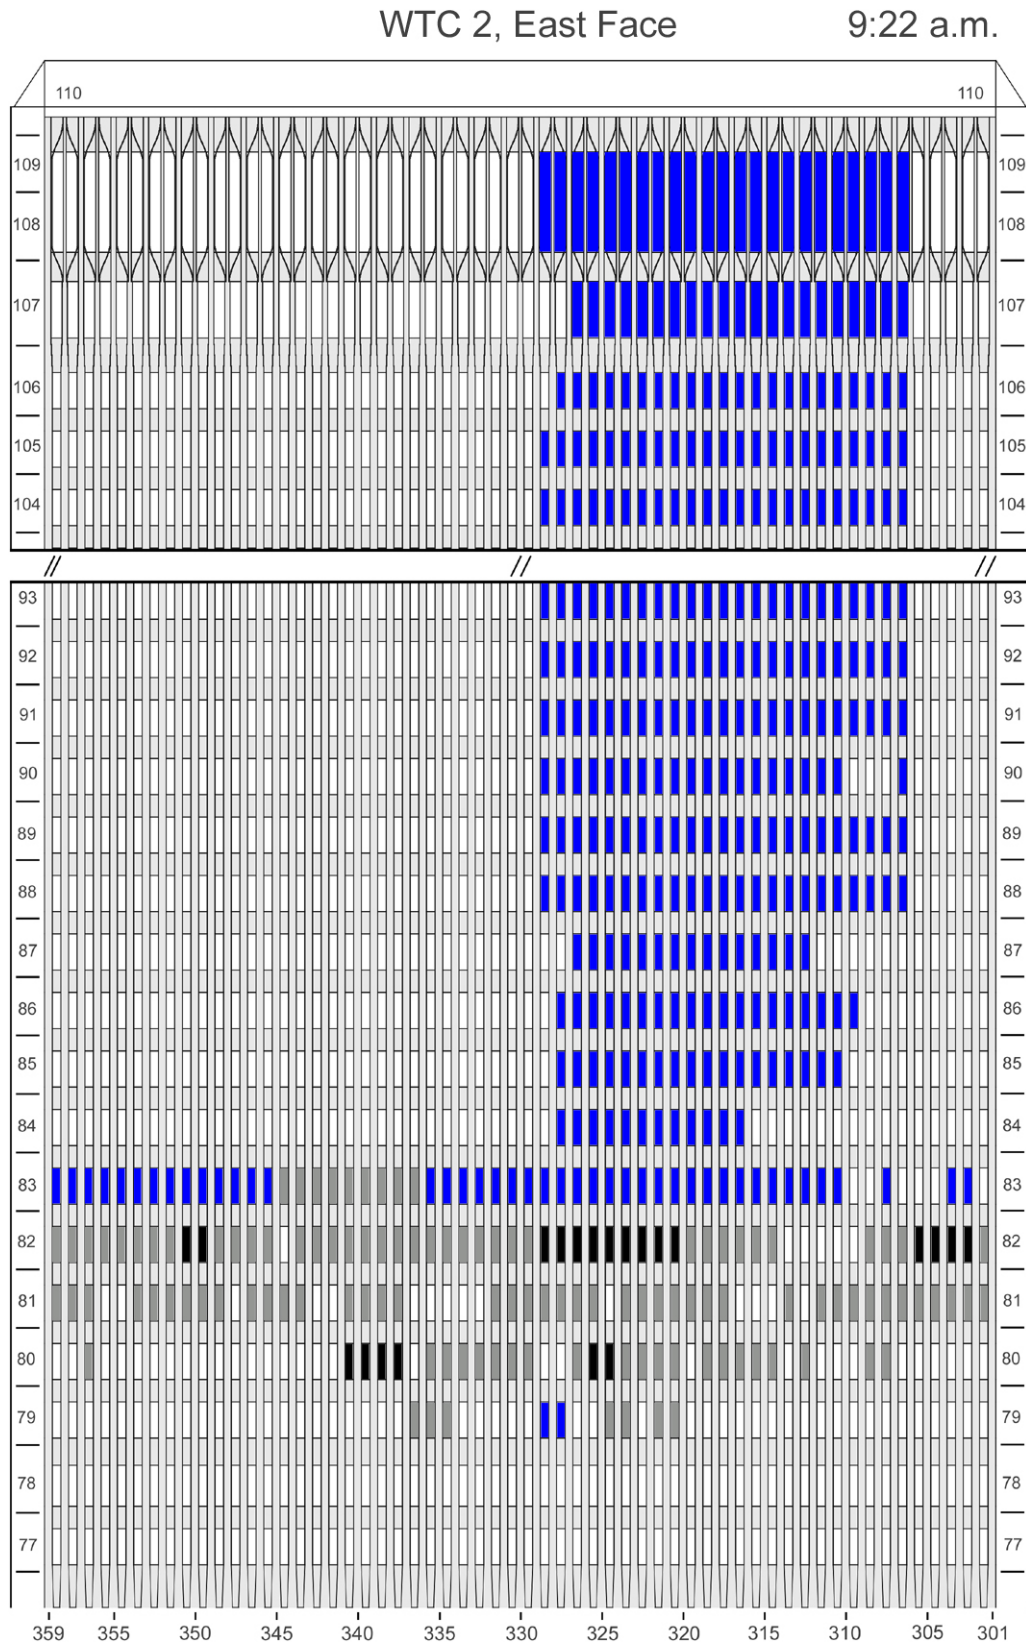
Diagram of the east face of WTC 2 for floors 77 to 93 and floors 104 to 110 at 9:22 a.m. showing windows where smoke was observed and those hidden from view.
